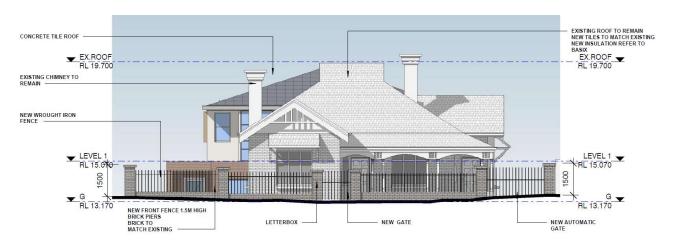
Street-frontage elevation of the existing dwelling and proposed addition (as amended).
